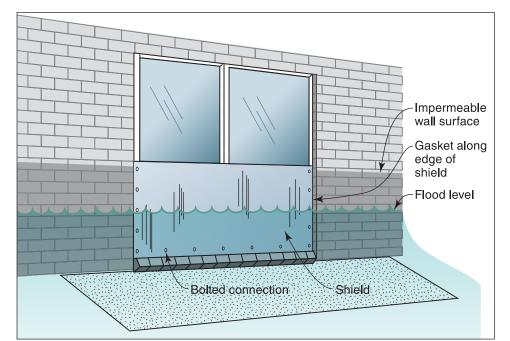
Window protected from low-level flooding by a flood shield and wall sealant
